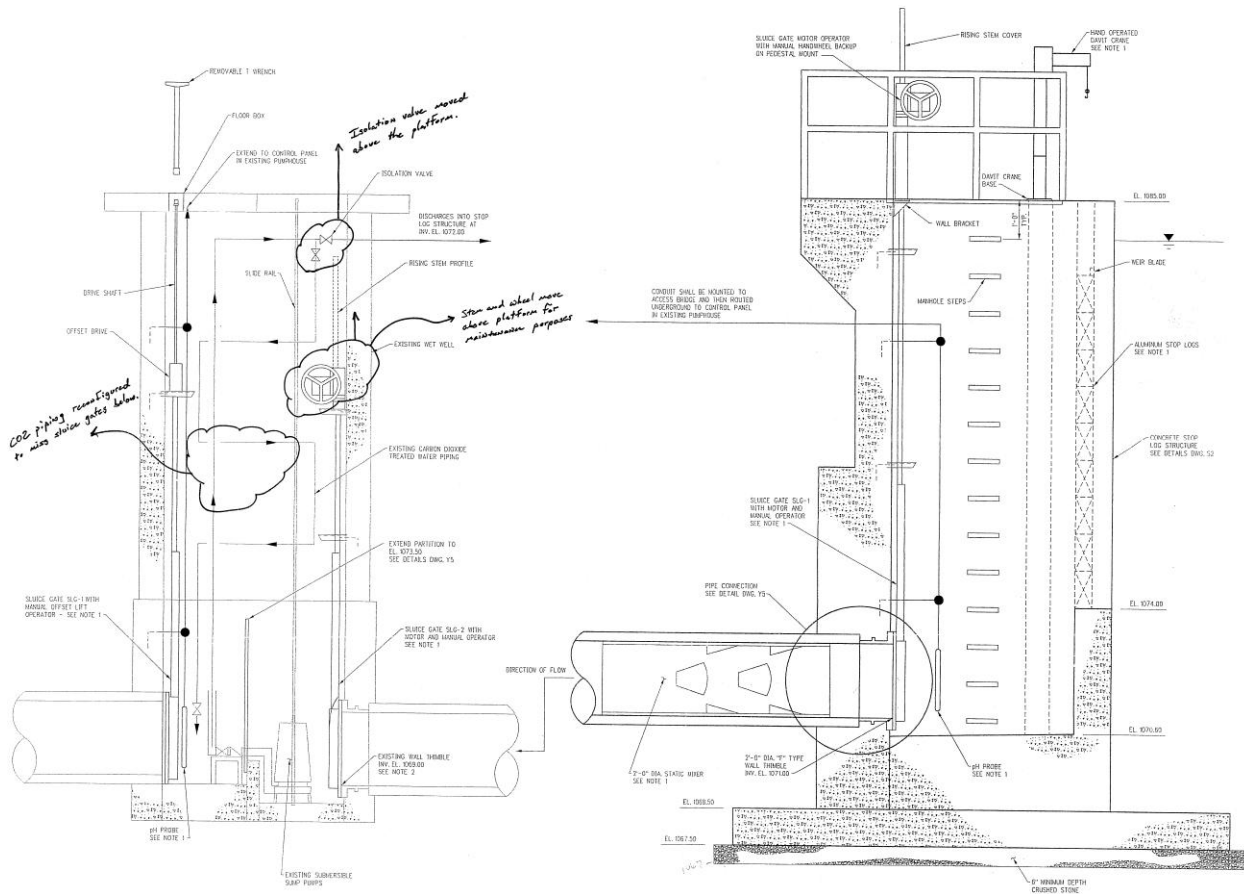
OUTLET STRUCTURE LAYOUT PLAN
